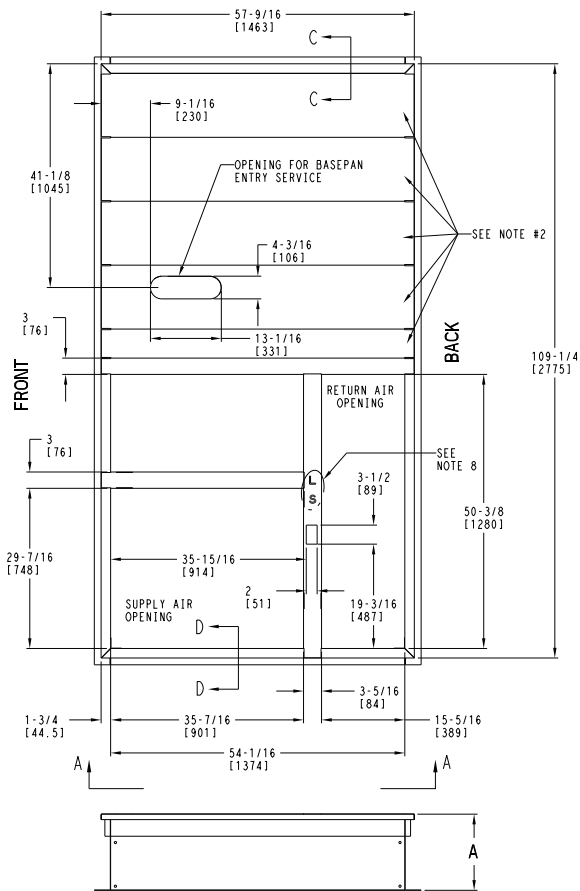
Roof Curb Details, 48WE*H08-12 Units
